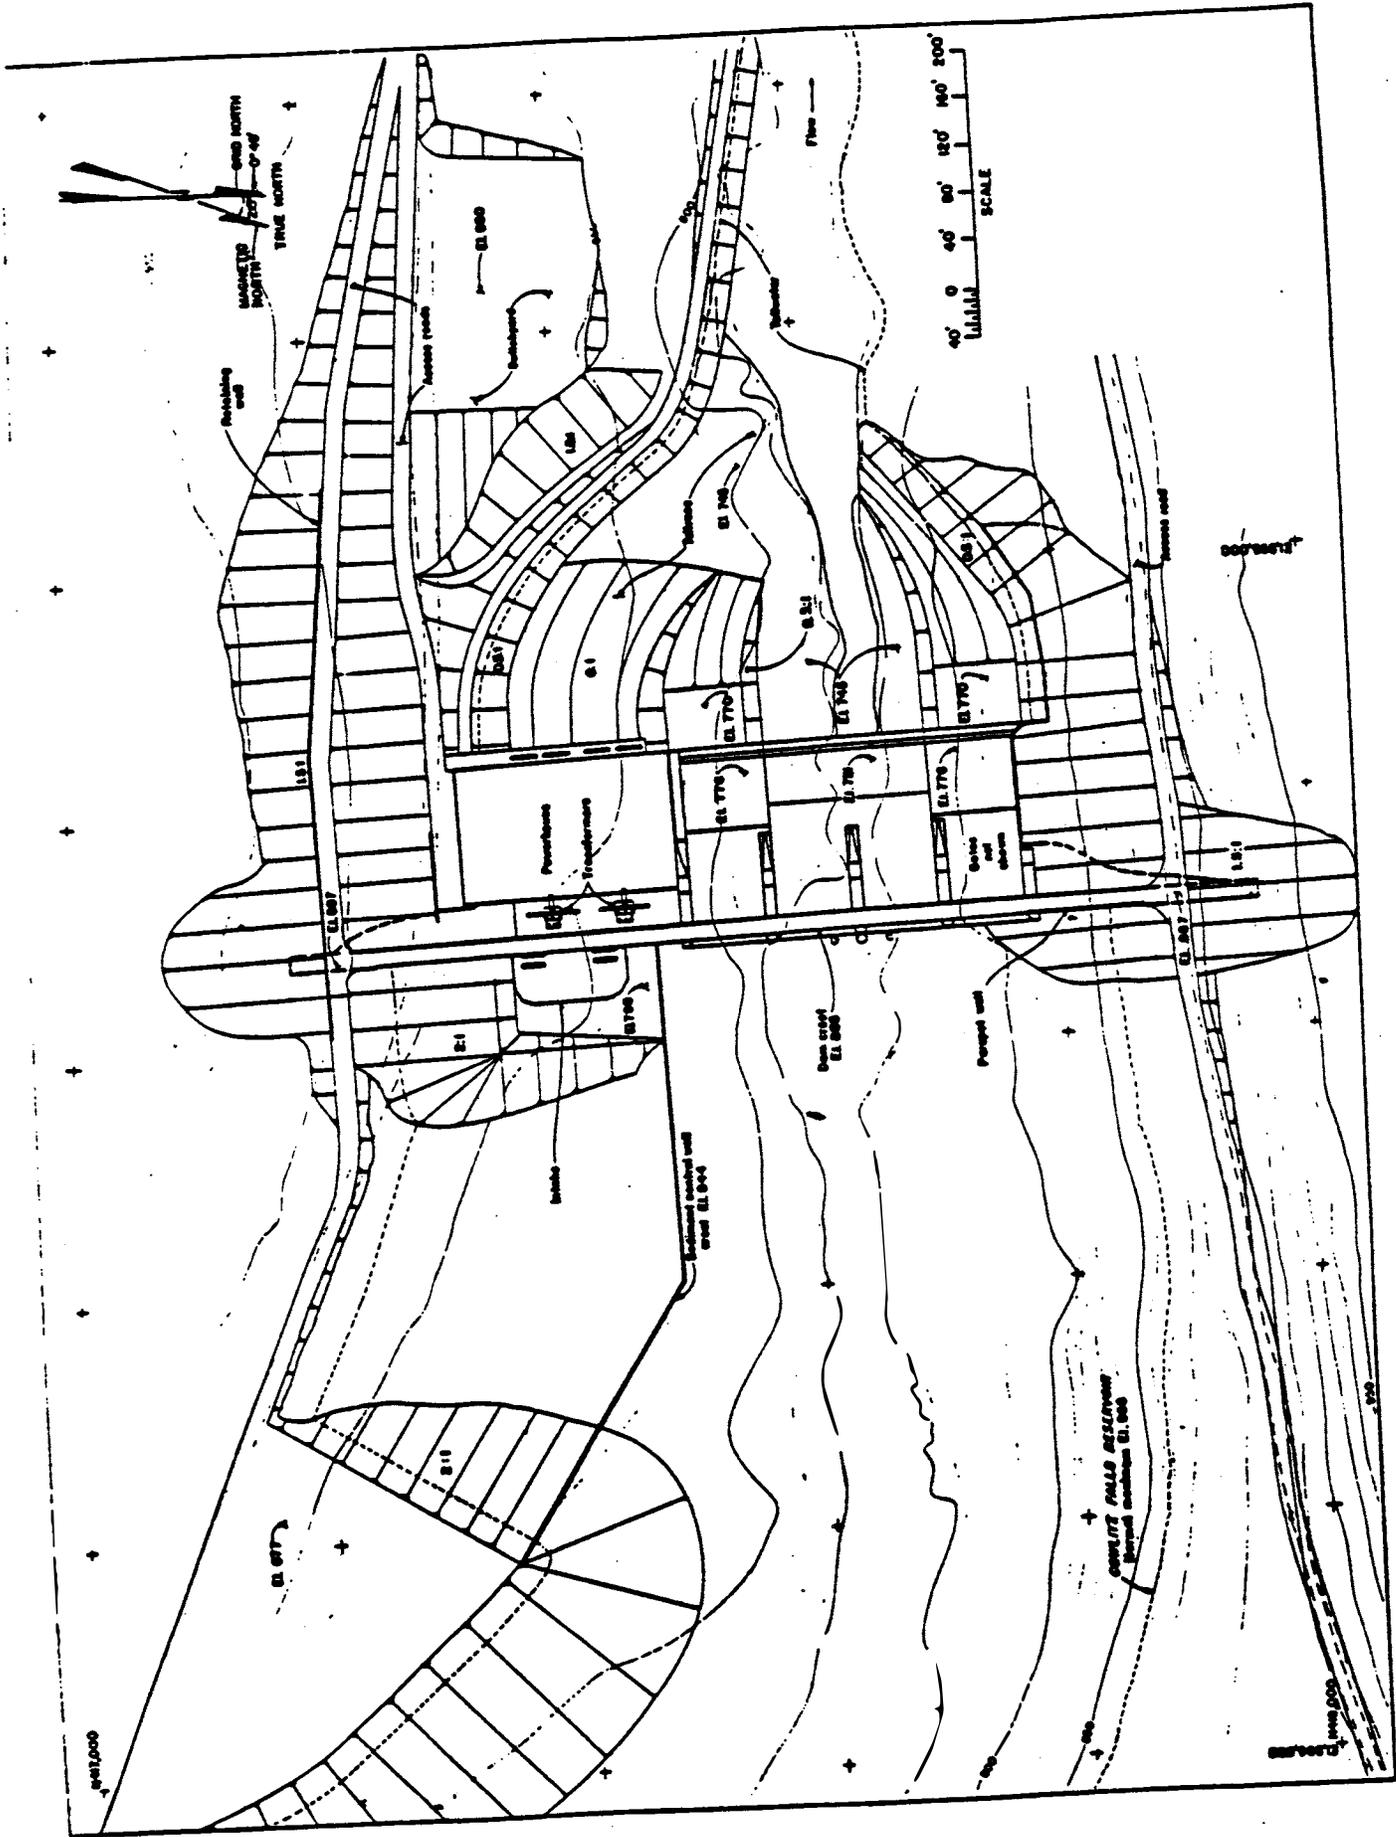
Proposed project plan (Source: Application, Exhibit W).
